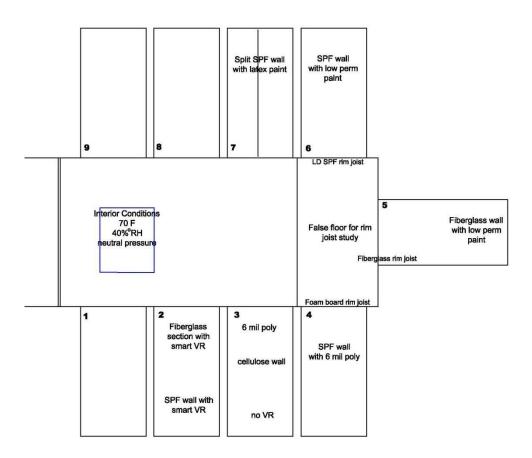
The layout of the MTL. The MTL was set in a clearing with wall #1 facing eastward and wall #5 facing to the north. Walls 1, 8 and 9 were not part of this study and are not discussed in this report.
